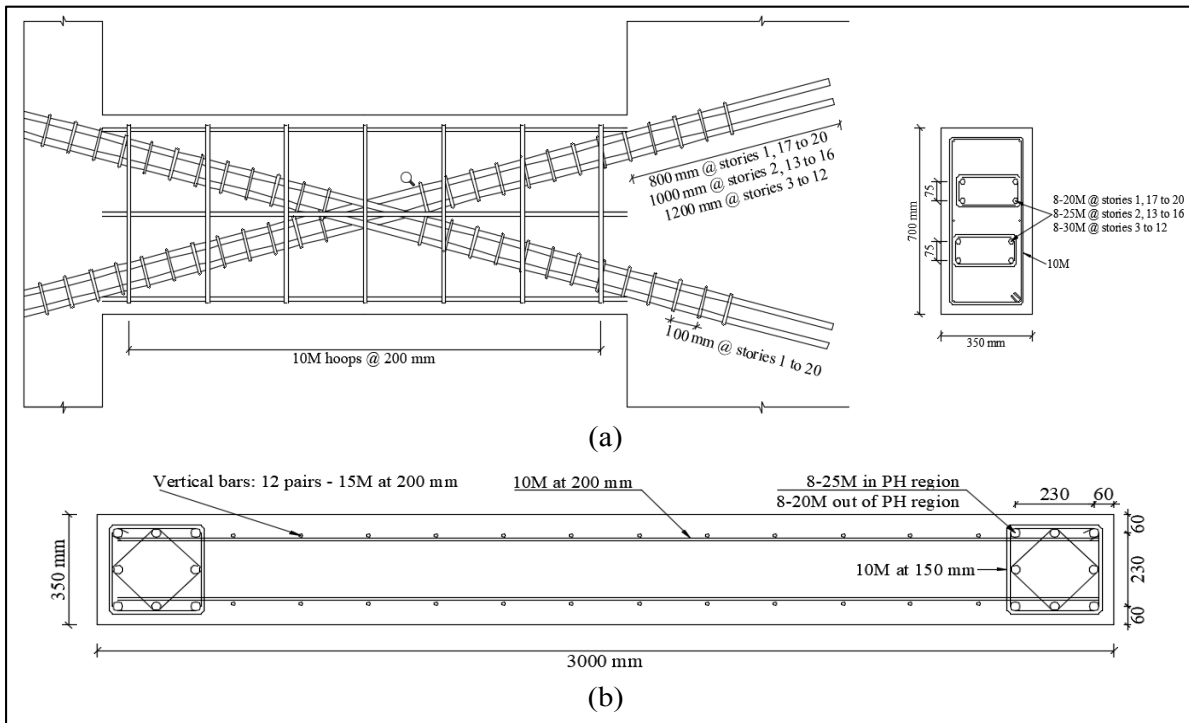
Design summary of CSW2015: (a) Reinforcement details of conventionally reinforced CBs, (b) Reinforcement details of one wall
